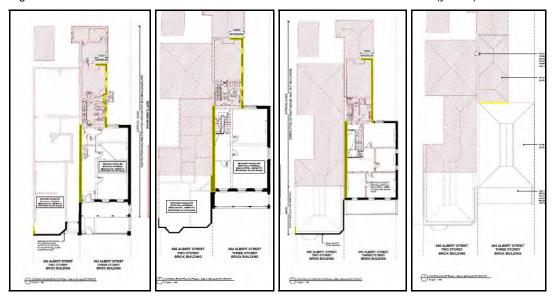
Walls highlighted in yellow to be demolished and reconstructed
